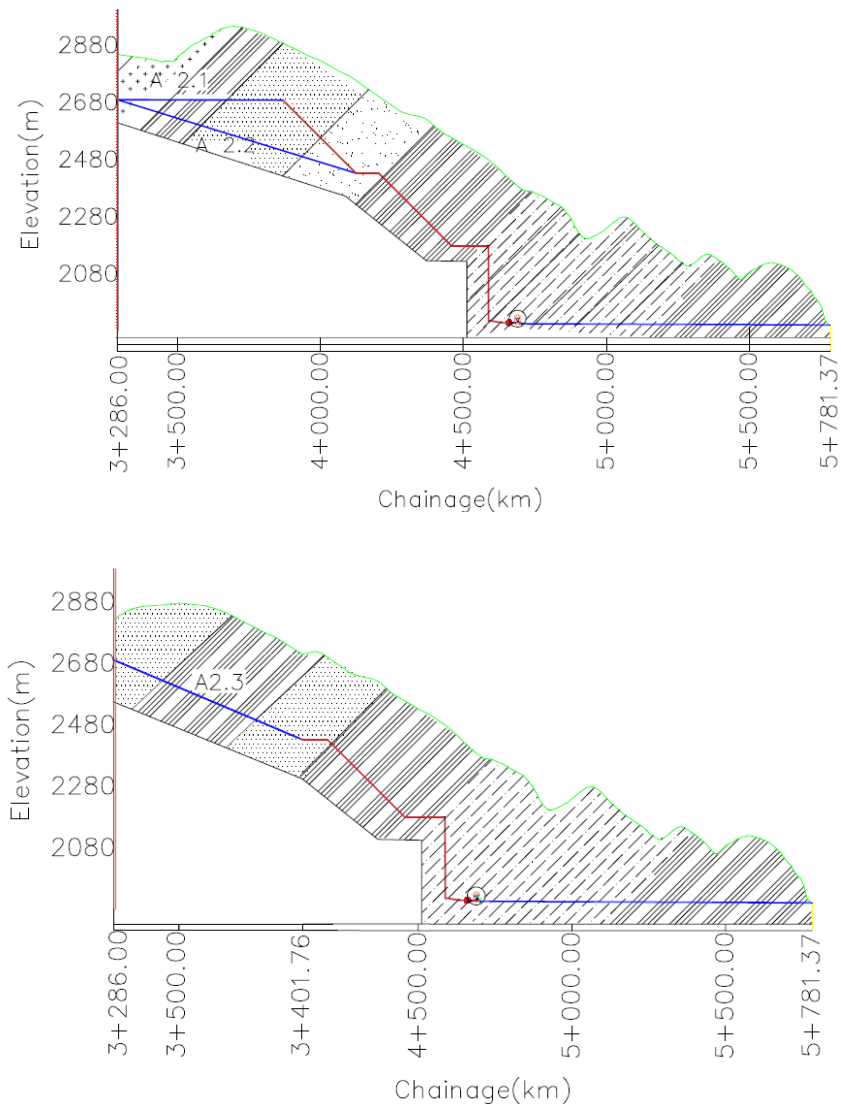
Profile alternative for Alignment A2.1, A2.2 & A2.3(Bottom)
